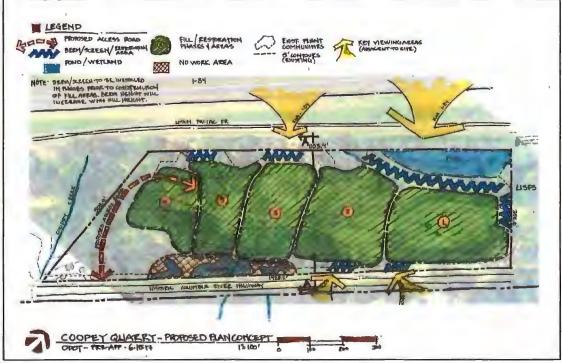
Proposed Plan Concept at Coopey Quarry showing location for the access road at west end of the quarry.
